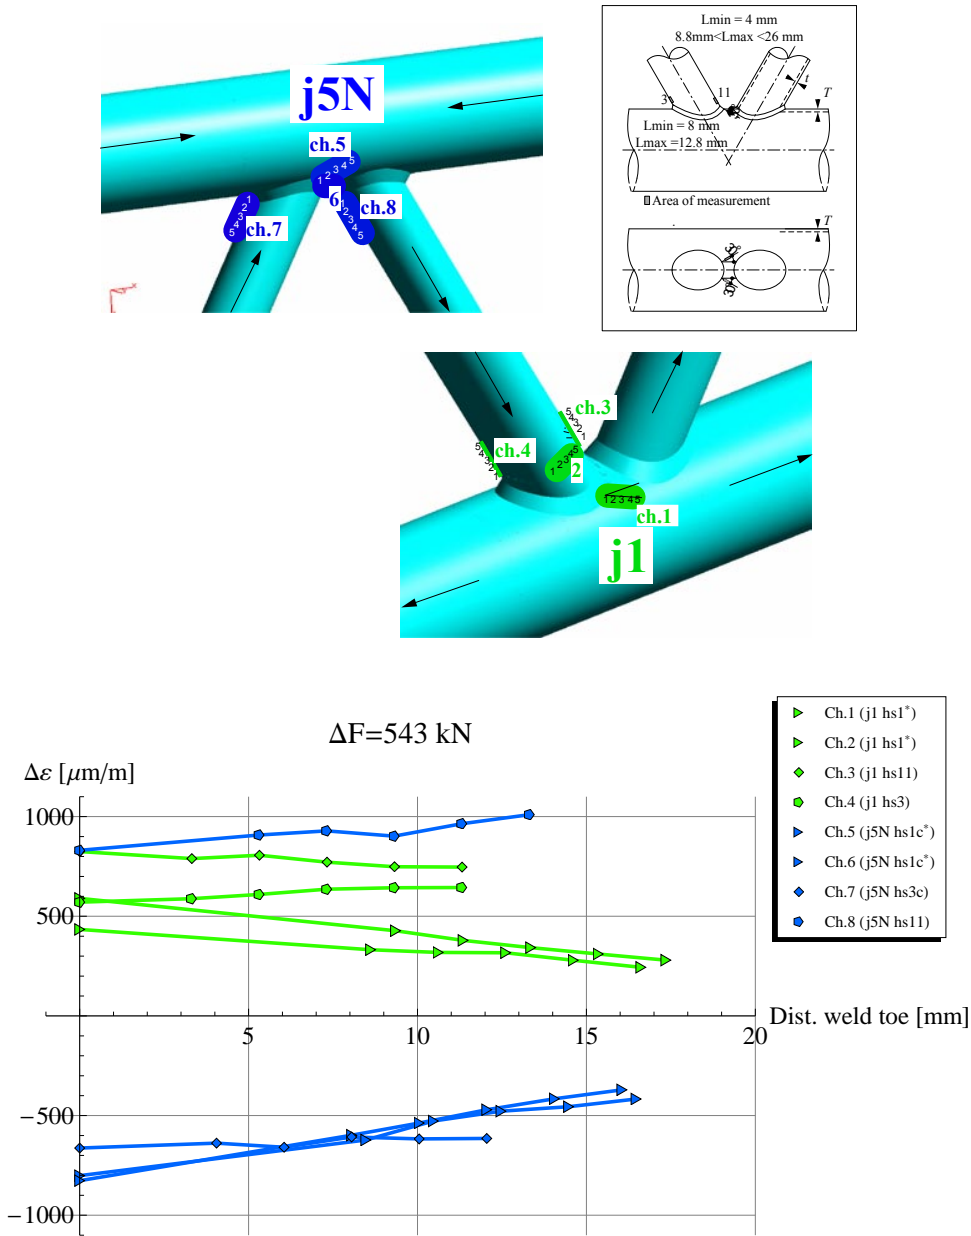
Strip gages installed in joint 1 and joint 5N of specimen S5-2. Strain range at surface near the weld toe in joints of specimen S5-2.
